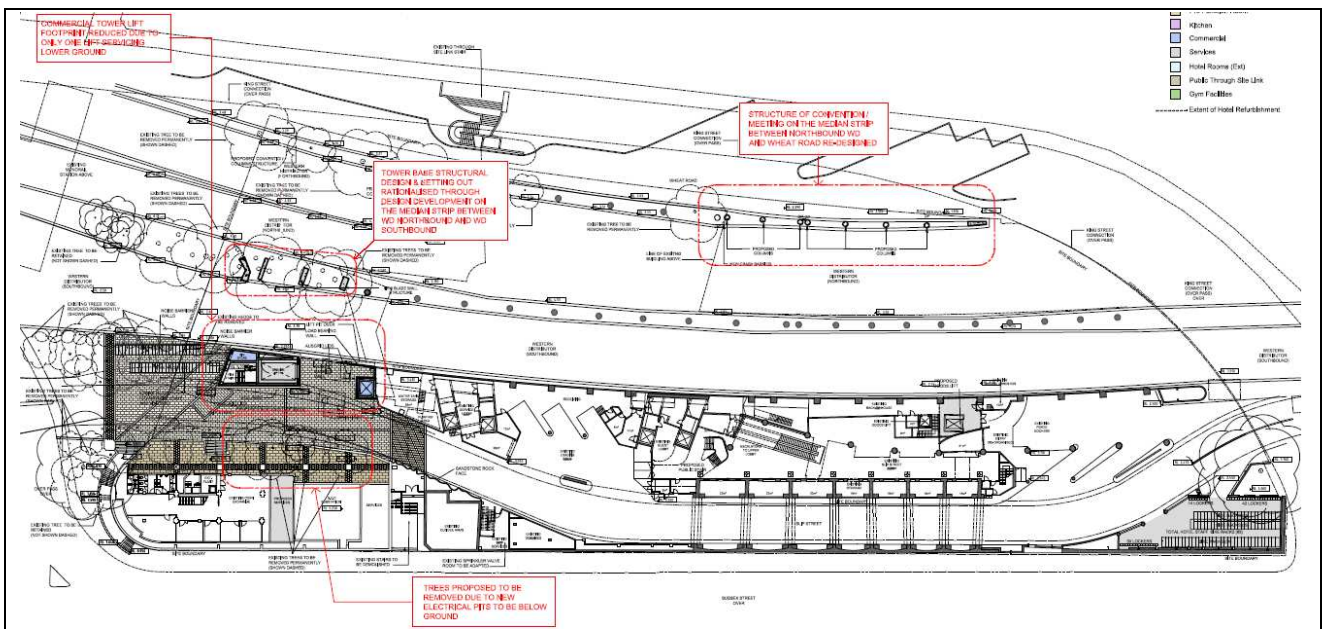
Proposed modified structural columns, trusses and footings design under the convention/function space and removal of 4 trees (Lower Ground Level)
